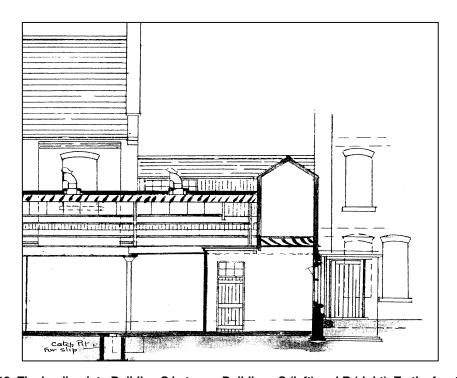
The landing into Building S between Buildings S (left) and R (right). To the front lies the dipping house (Building O) with the bridge at the west end of it running from Building \mathbf{M} . ¹⁹
